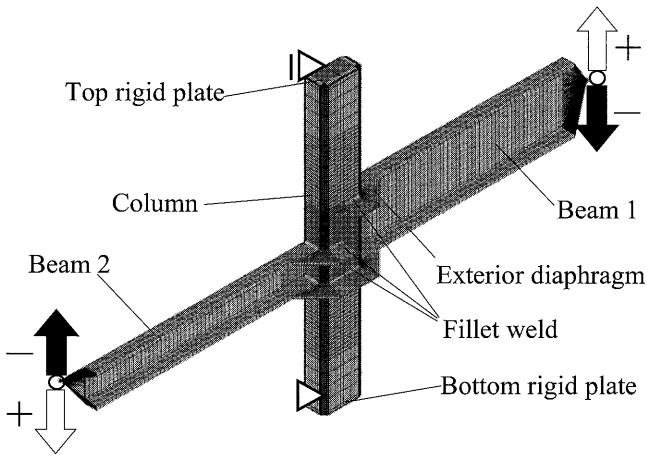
Finite element model for the offset beam-to-CFT column connection
